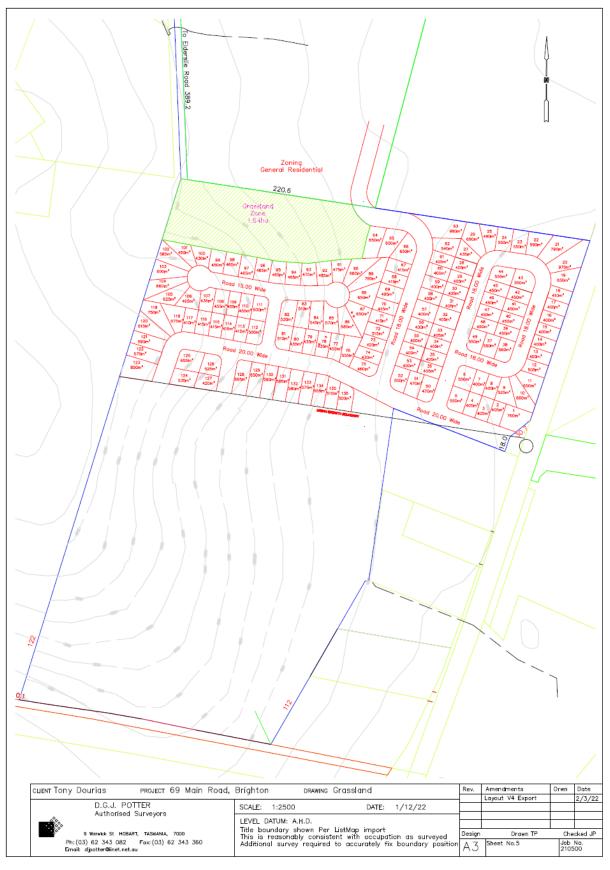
Proposed Stage 1 subdivision layout at 69 Brighton Road.
